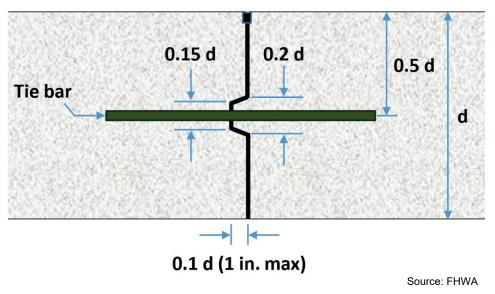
Recommended keyway dimensions for highway paving (only for pavements >10 inches thick) (FHWA 1990).
